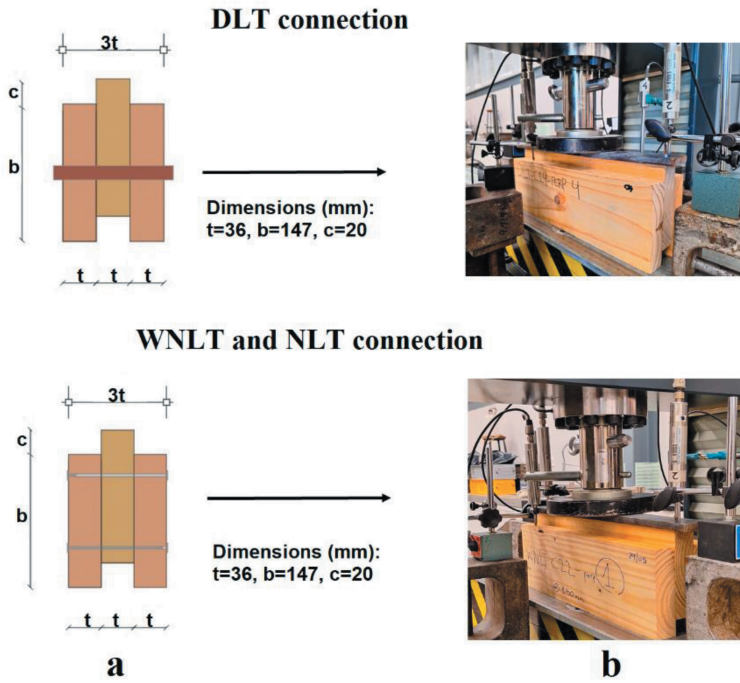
Shear tests on timber perpendicular to the grain connections. a. Geometric configuration. b. Test setup.
